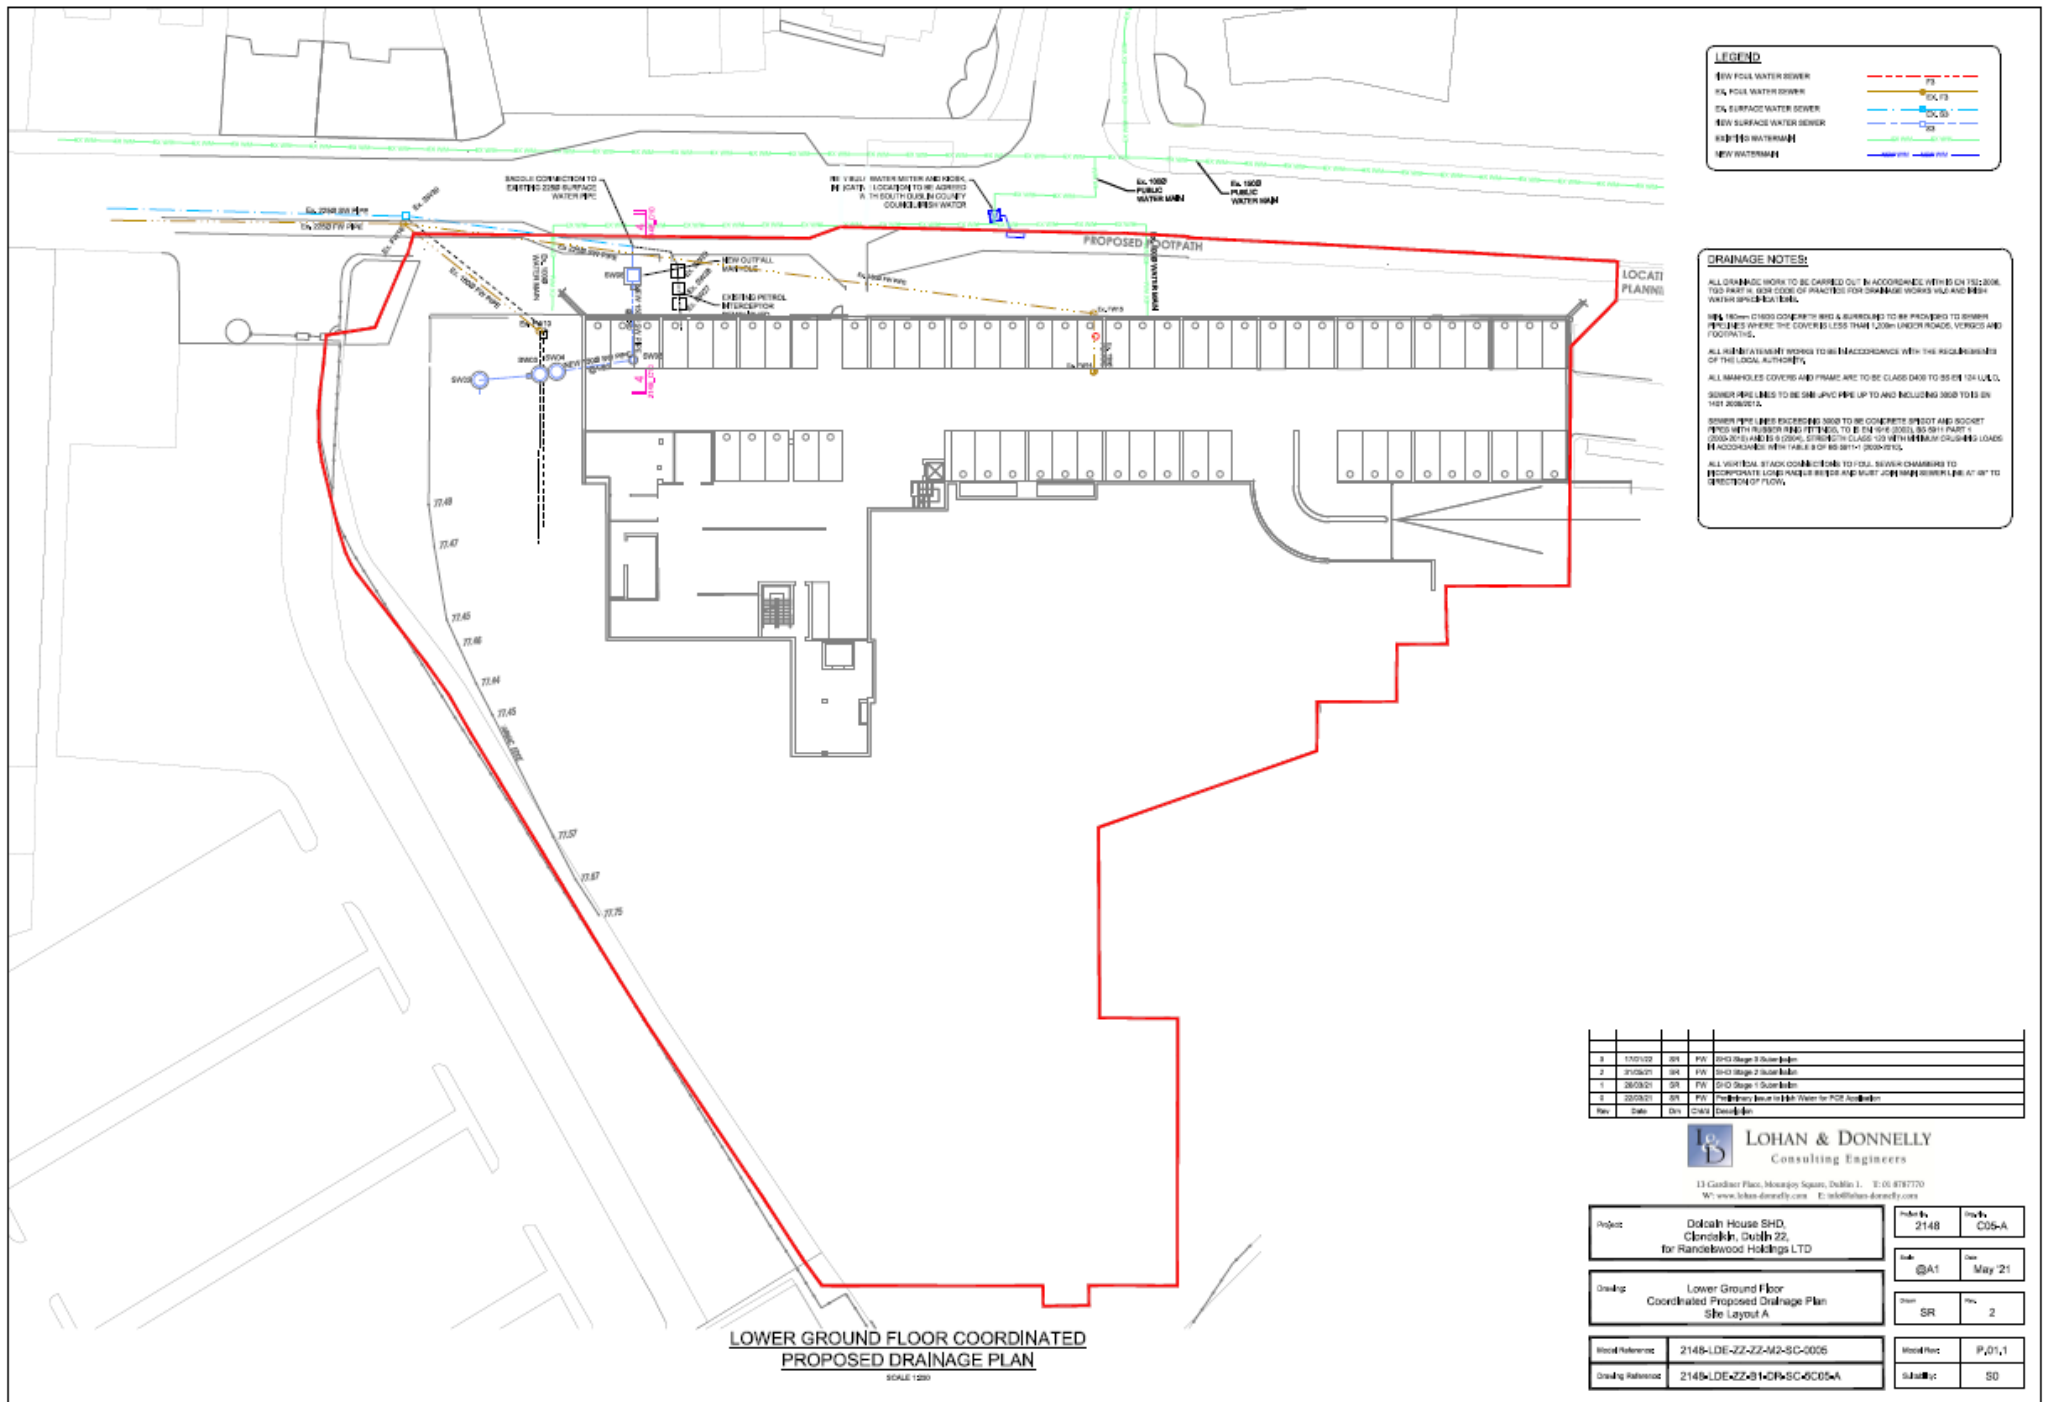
Proposed drainage plan - lower ground floor (co-ordinated)
